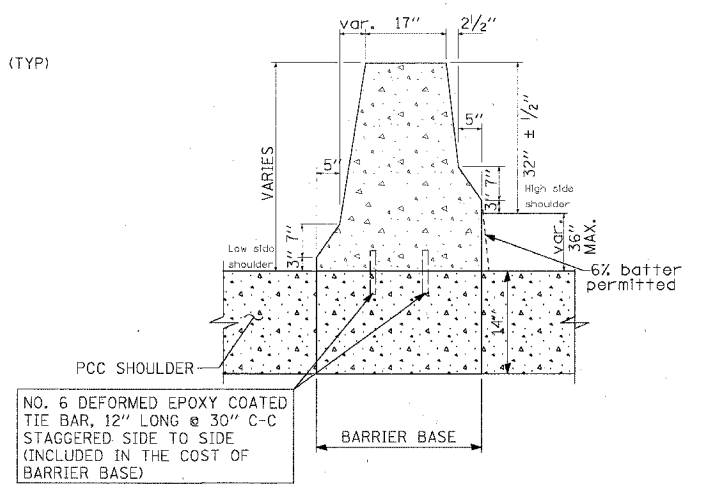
DETAIL OF "CONCRETE BARRIER TRANSITION" FOR DOUBLE FACE BARRIER WALL
